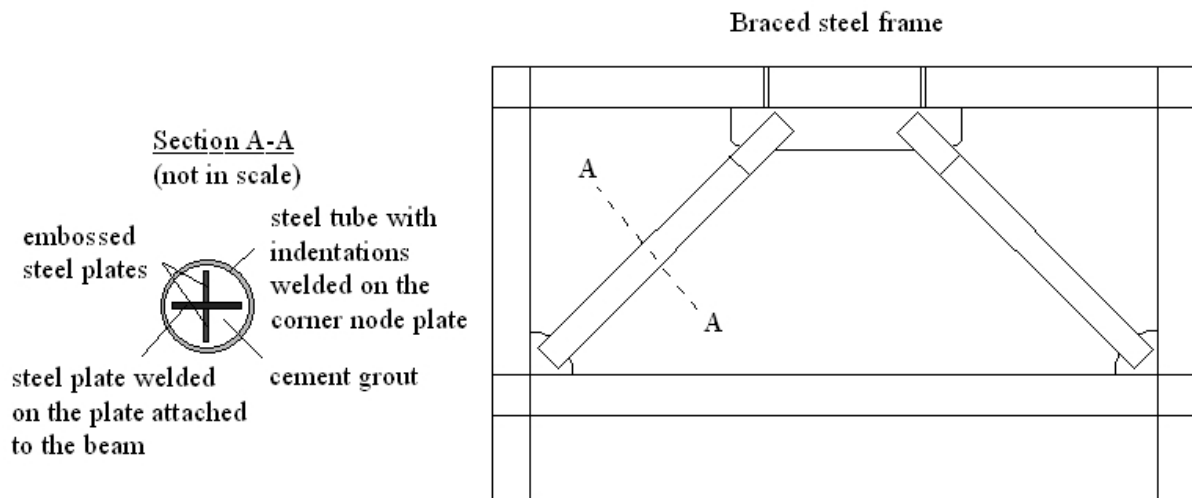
Damping bracing system based on an embossed steel-cement grout interface
